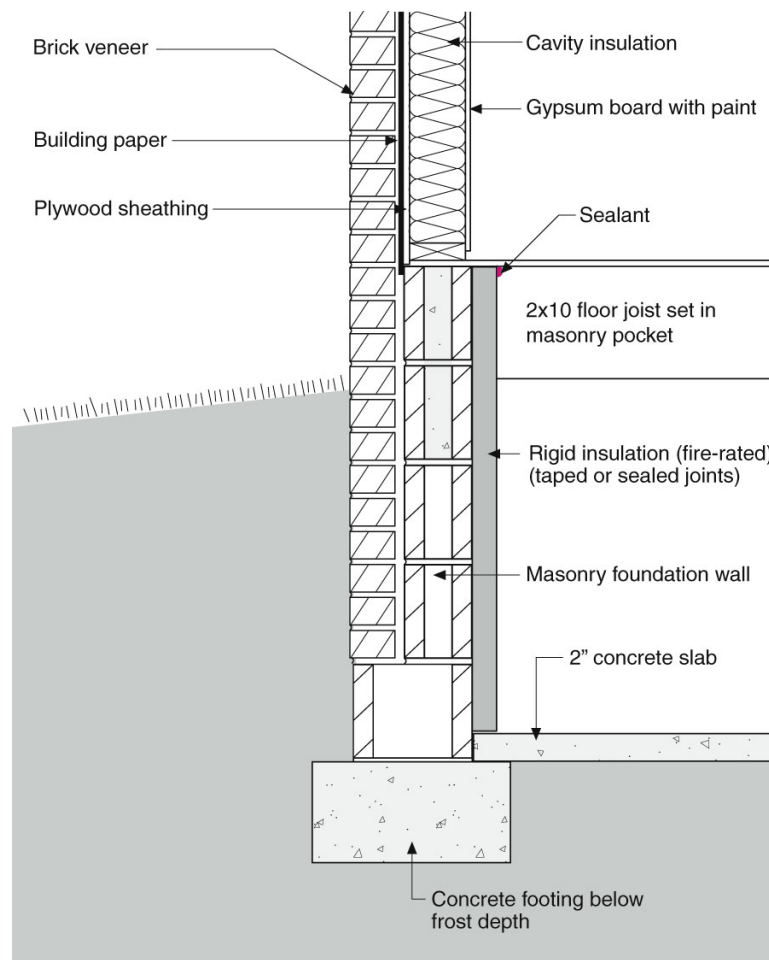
Section drawing of the “as-built” crawlspace wall after the wall insulation retrofit
